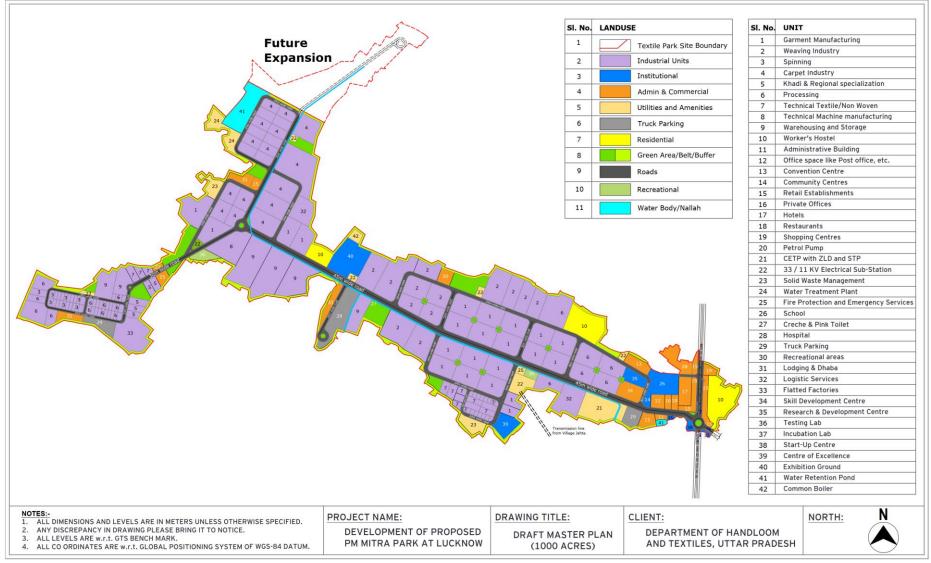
PROPOSED MASTER PLAN OF PM-MITRA PARK AT LUCKNOW
